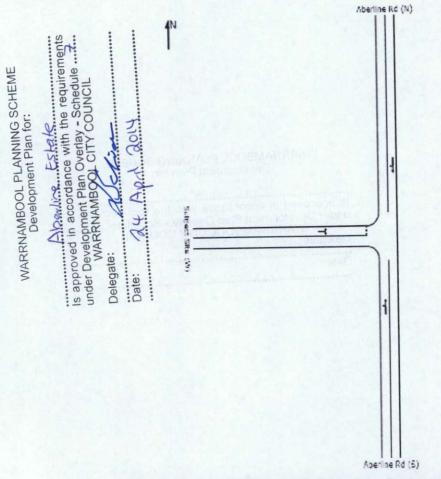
Modelled Intersection Layout - Proposed Southern Aberline Rd Access
